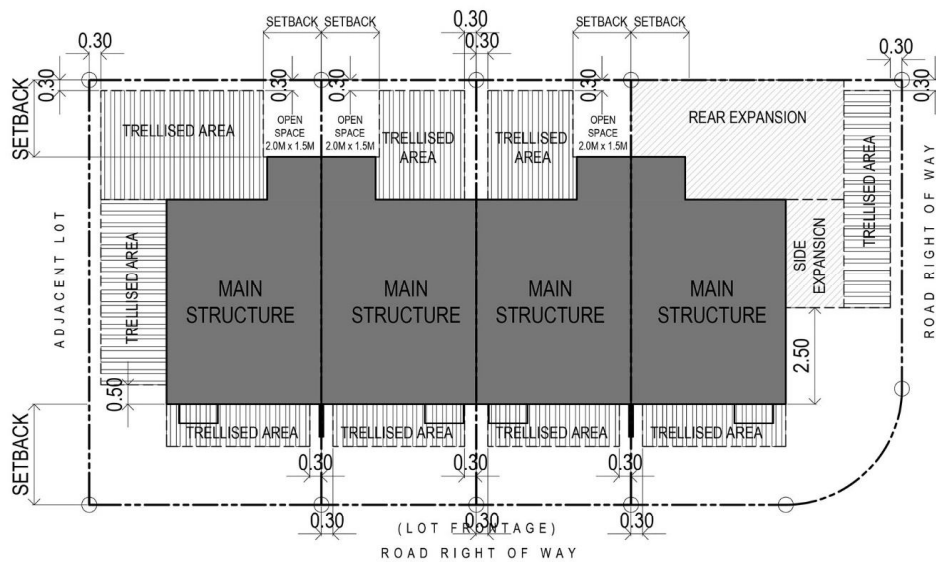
Trellised Area for BP220 Development - Townhouses - Ground Floor
